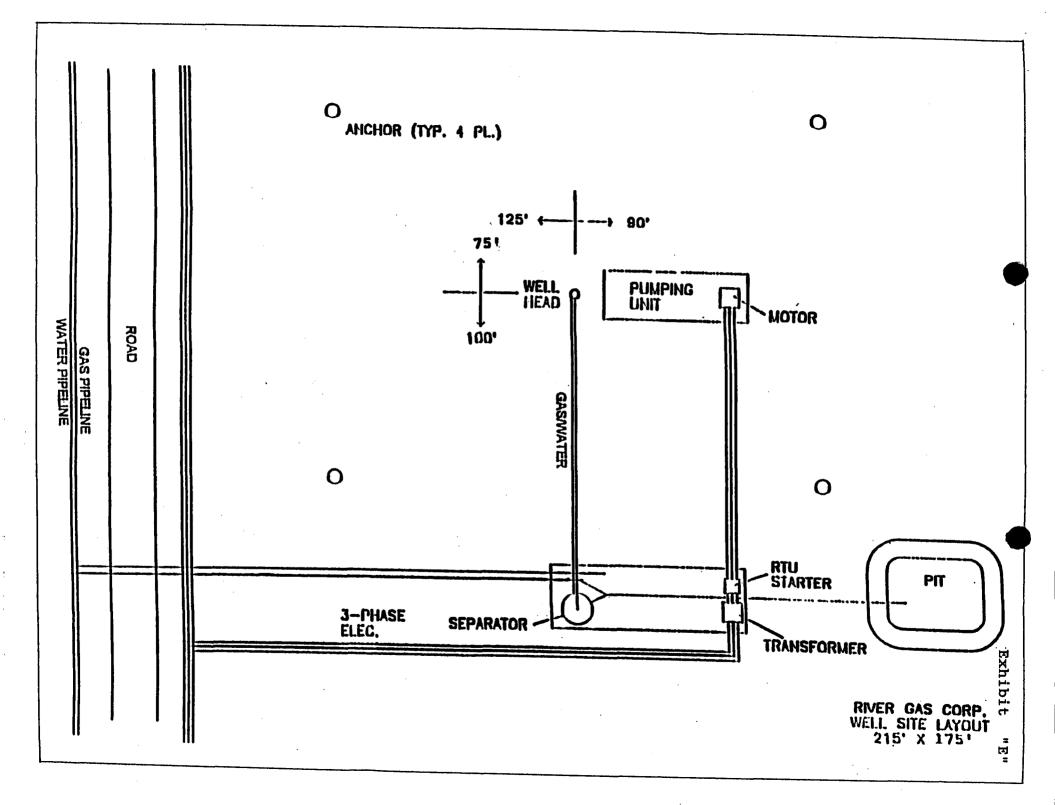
EXHIBIT "E" MULTIPOINT SURFACE USE PLAN
